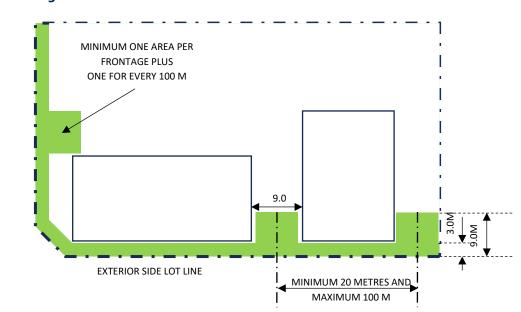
Front and Exterior Side Setbacks and Setback Areas
